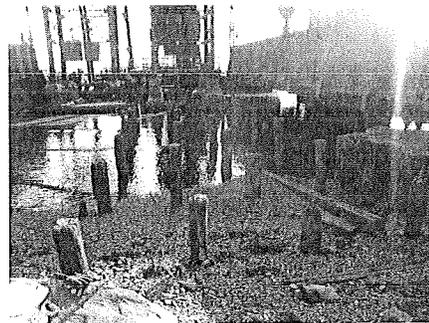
North side of bridge showing north pile field and pedestals, looking east.
